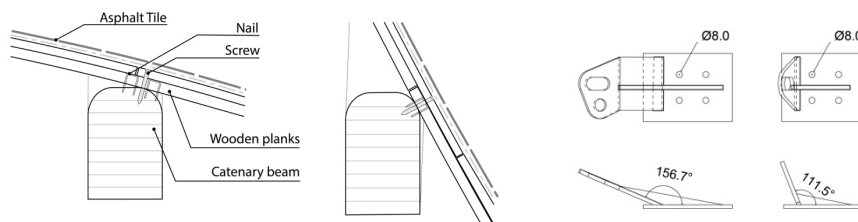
a) Roof floor to beam connection detail at high point and low point; b) Parametric connection detail design
